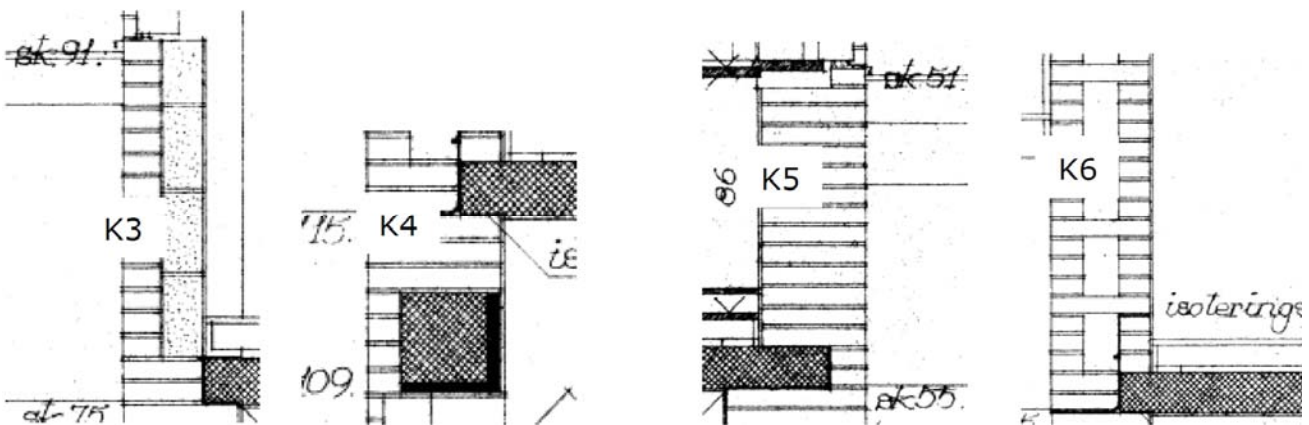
At the base of the building the exterior solid brick wall is 480 mm thick starting 220 mm above the ground level and of 480 mm concrete under the ground level (K1, K2). Exterior solid brick wall at the ground floor (K5), the 1st and 2nd floor exterior cavity brick wall with brick joints (K6). The wall below windows is brick in front of siporex (K3) and above windows it is brick on concrete with wooden concrete on the interior side of the exterior wall (K4). Horizontal partition is reinforced concrete.
